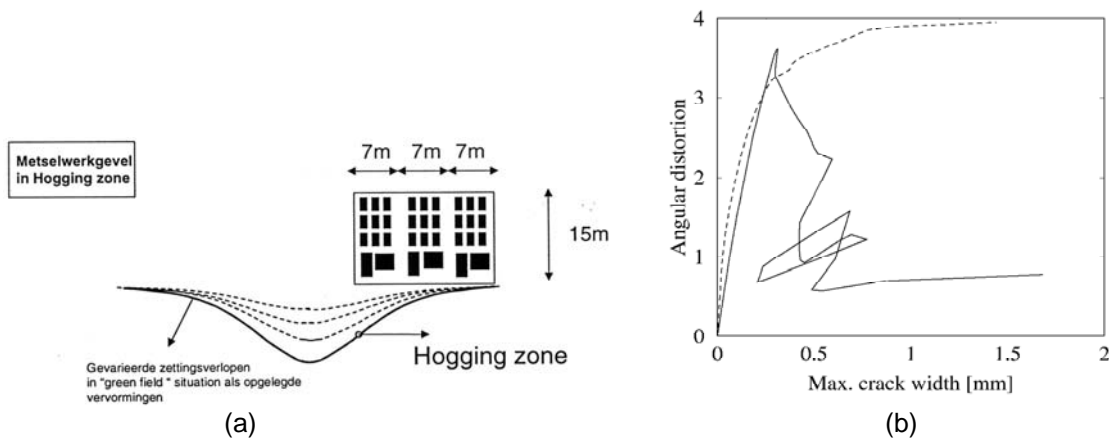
Settlement trough and position of masonry façade in hogging zone (a); Response of the masonry façade. Smeared (dashed) and discrete (drawn) (b).
